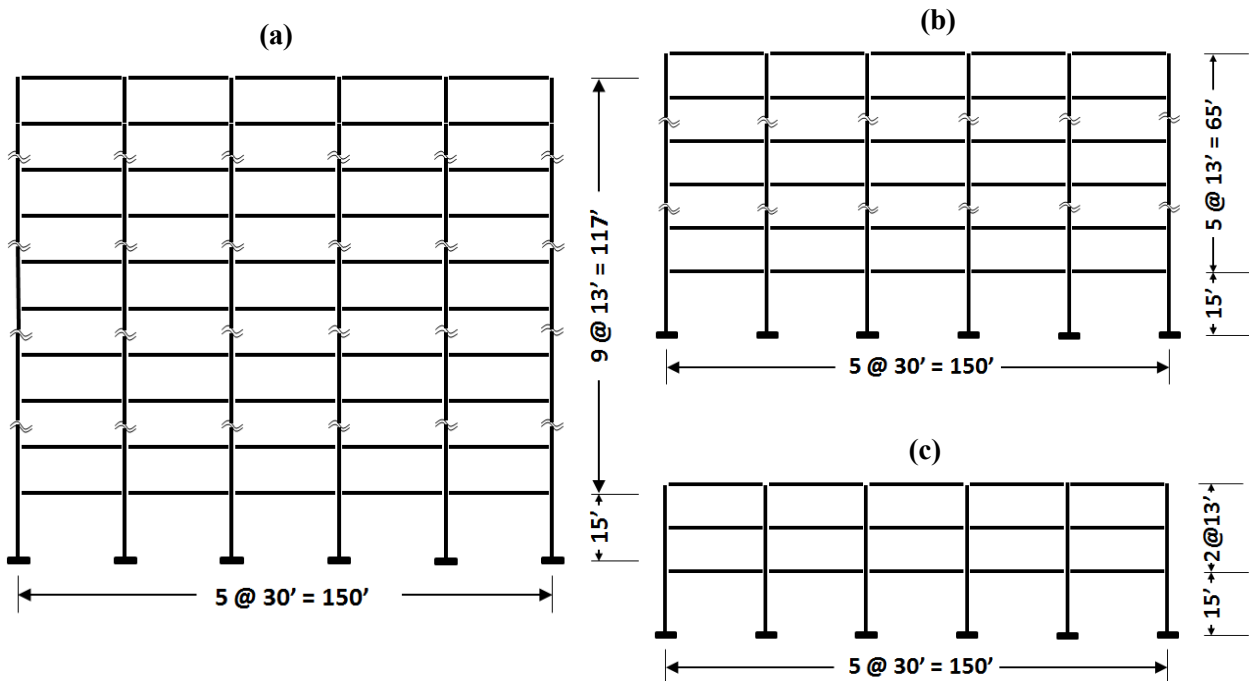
Elevations of (a) 10 story (b) 6 story and (c) 3 Story Models
